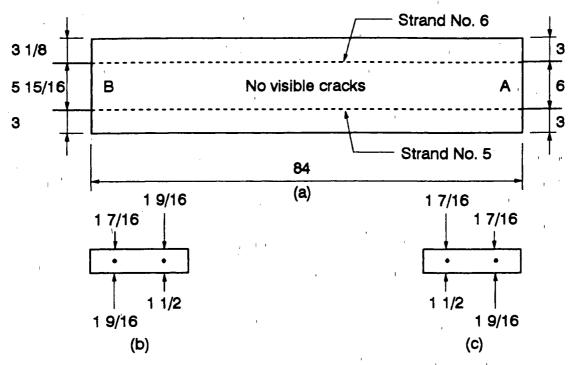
Specimen No. 4-3.0TC-3 (dimensions shown in inches):
